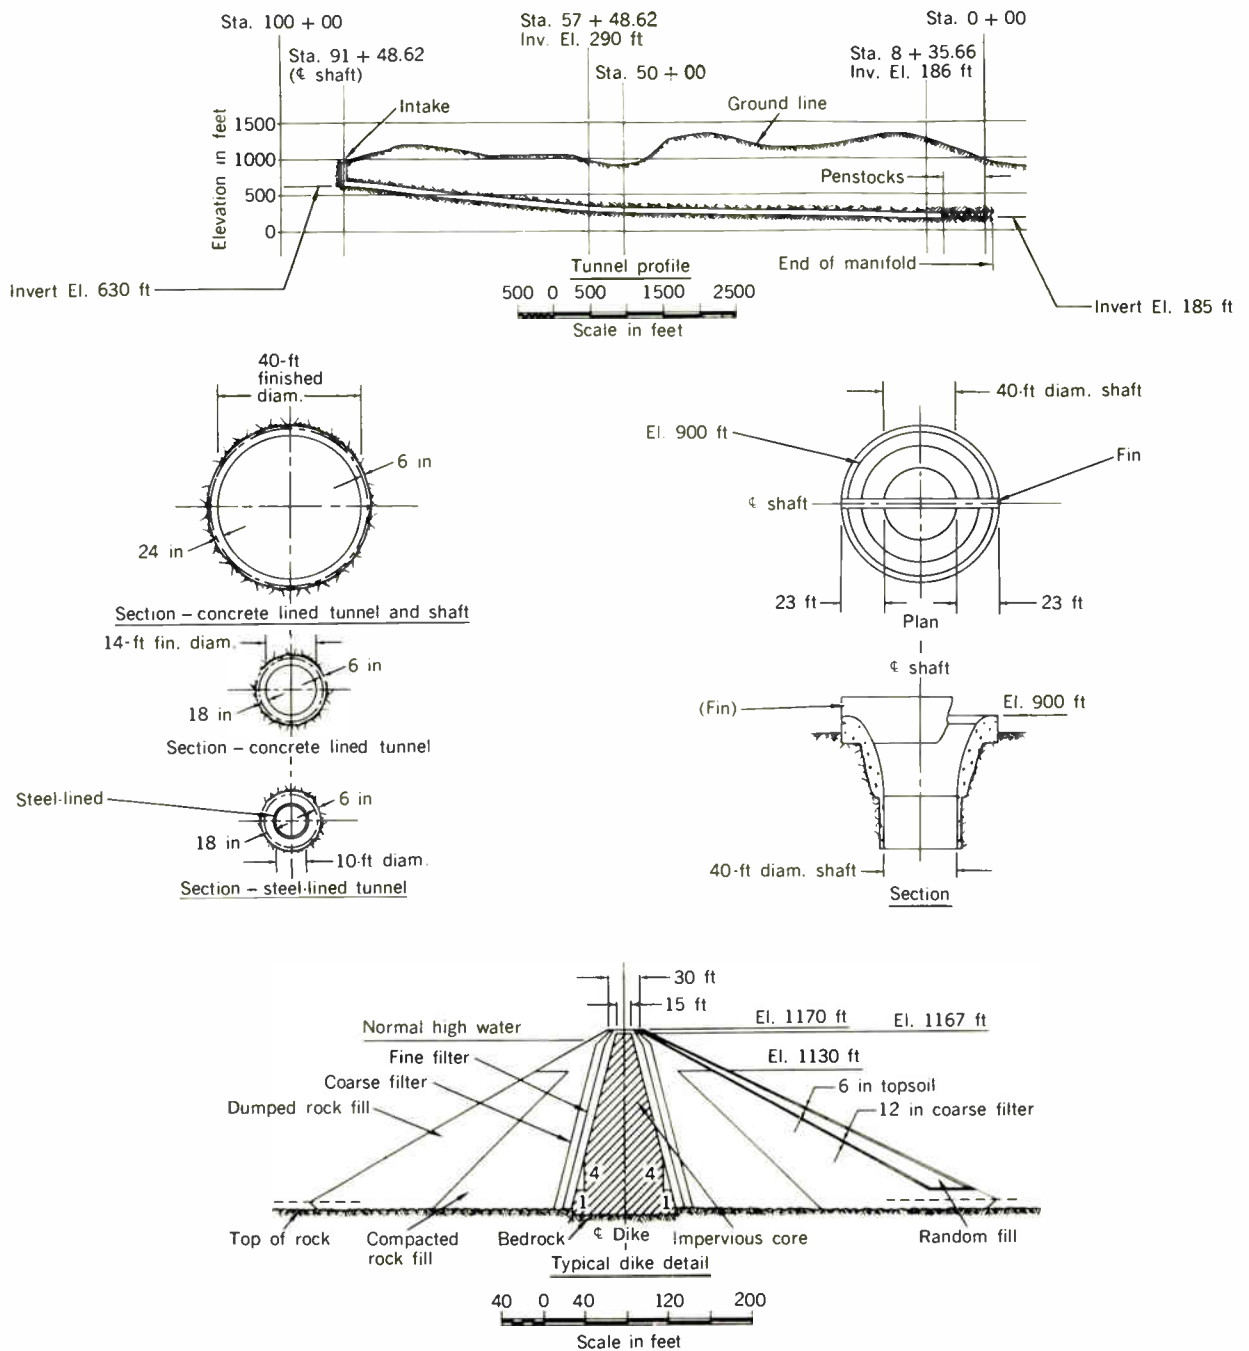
Sections and details are shown for the proposed Cornwall pumped-storage development.
